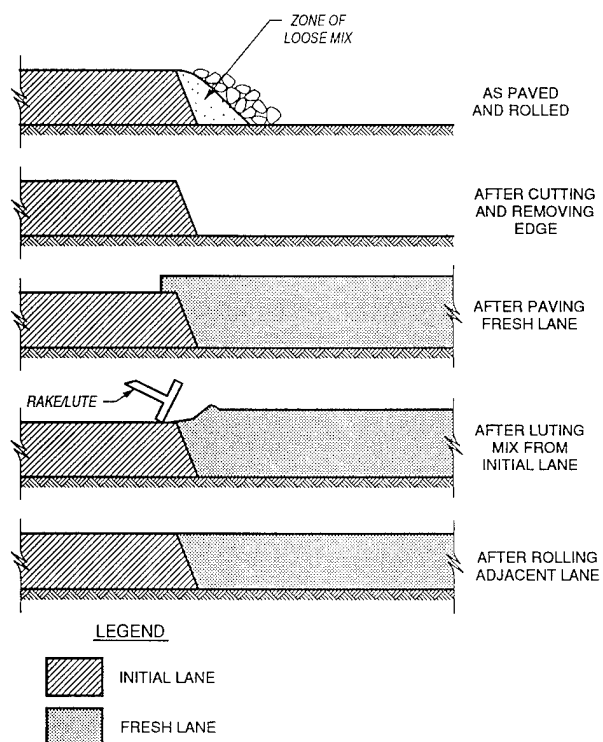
CUT AND REMOVAL JOINT CONSTRUCTION
